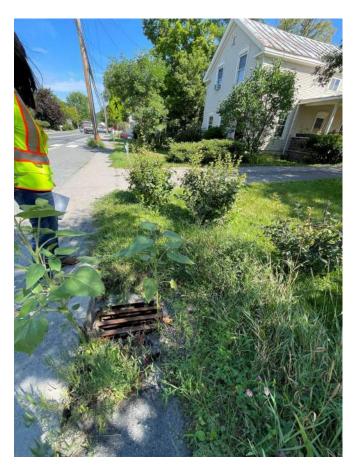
Existing drainage inlet southeast of the United Church crosswalk, in poor condition, overgrown.
